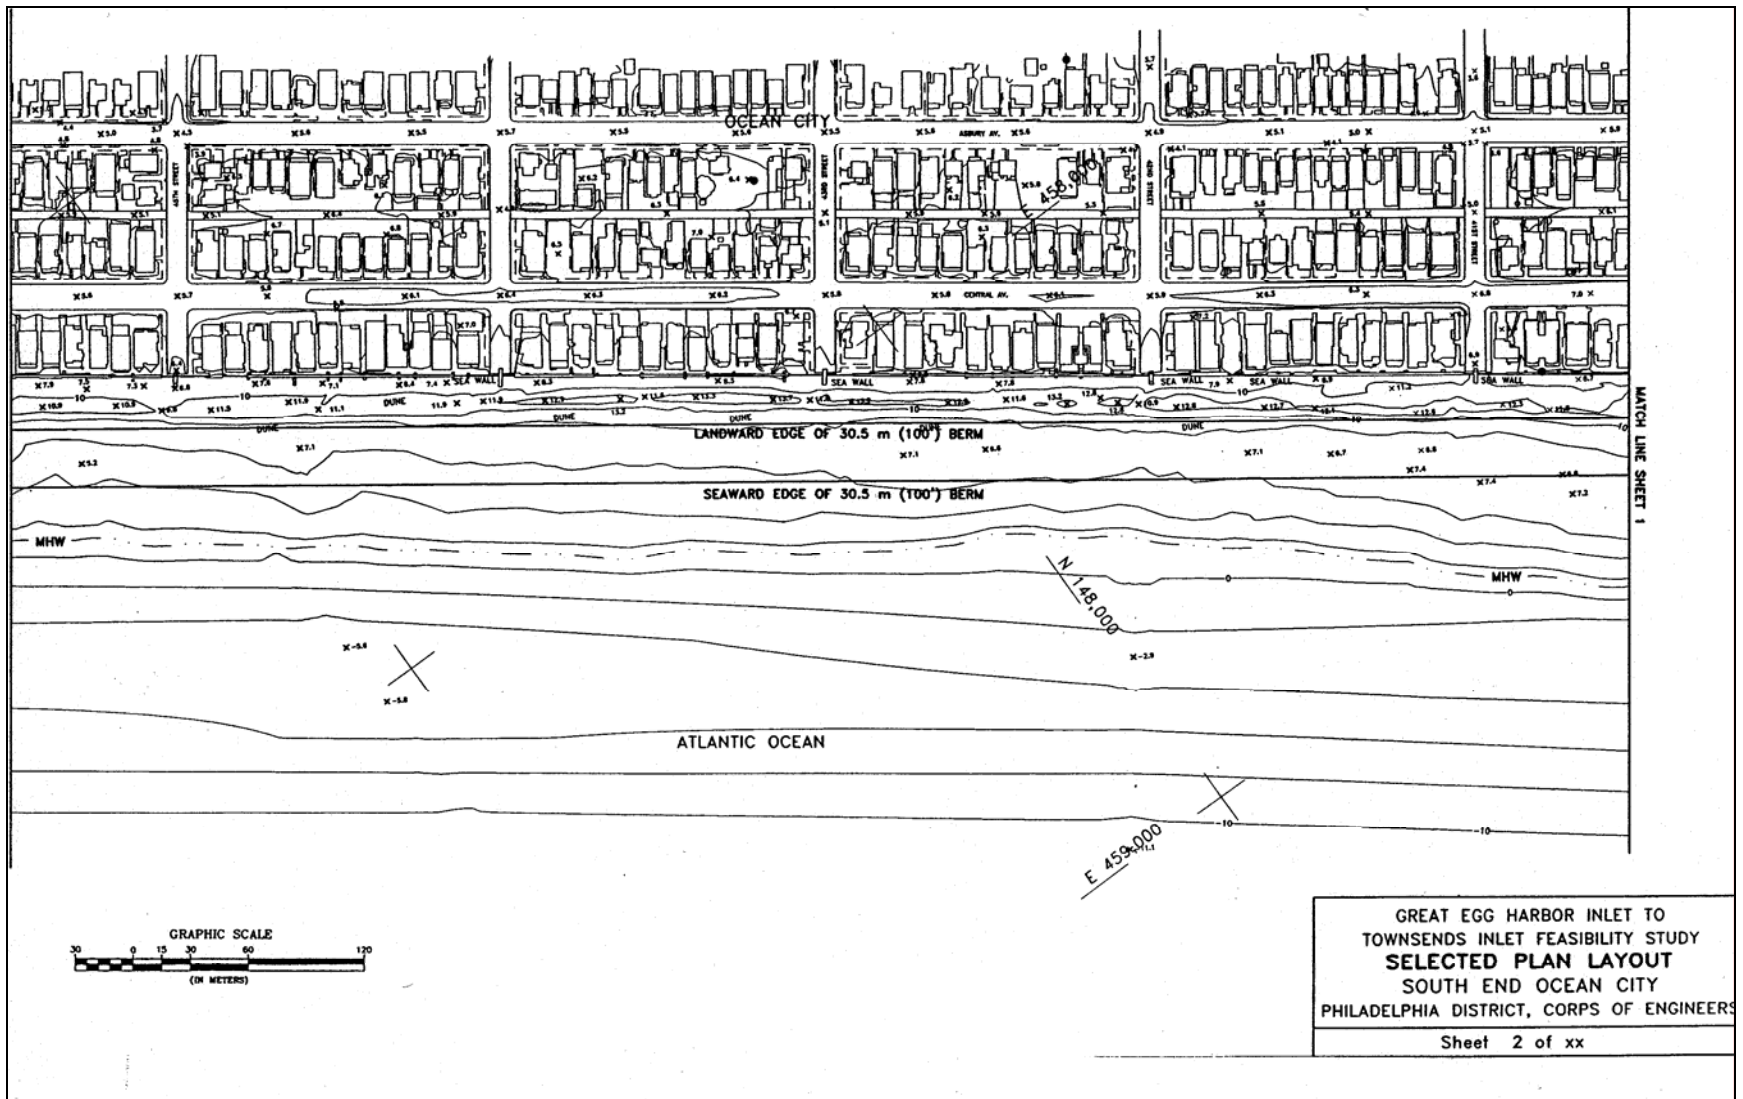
Selected Plan Layout for Ocean City, NJ – South of 40th Street to south of 45th Street
